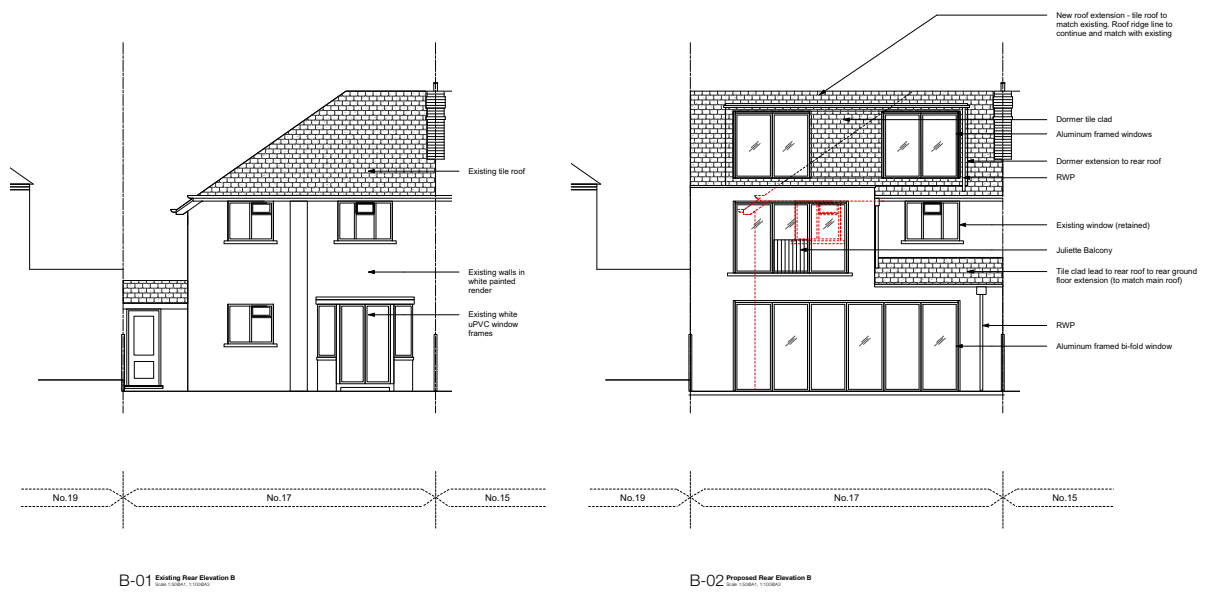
Existing and Proposed Rear Elevations (not to scale)
